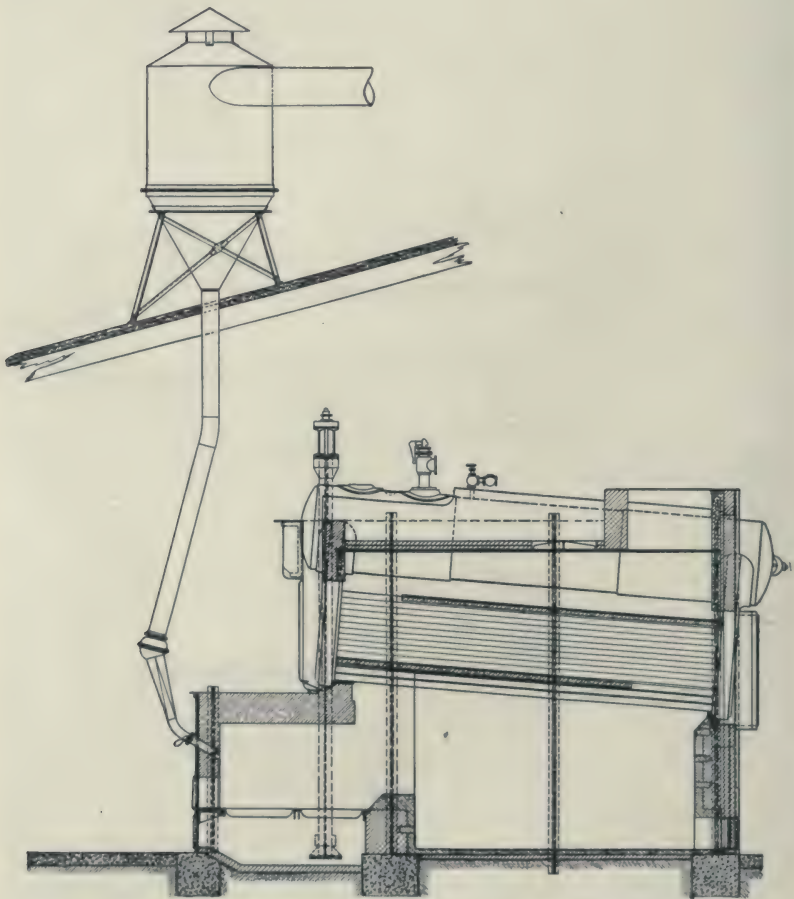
Burning Wood Refuse Carried by Pneumatic Conveyors.
